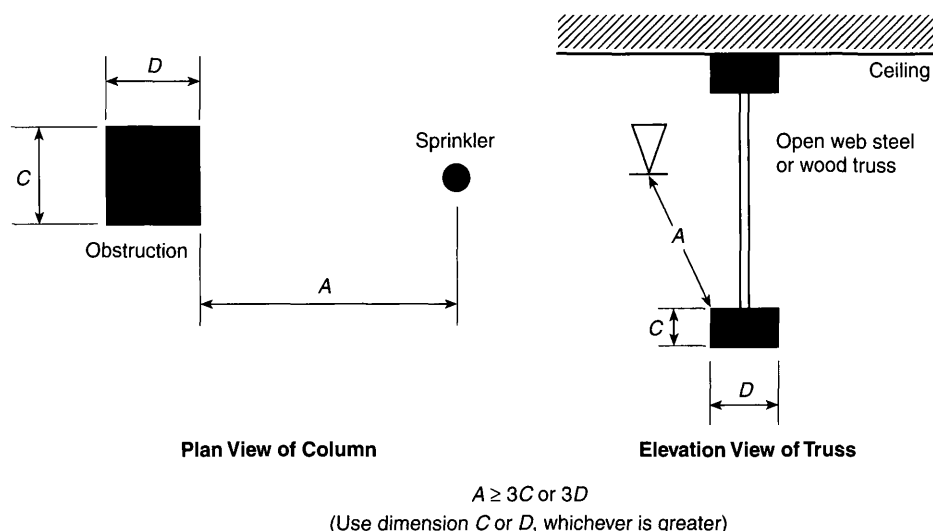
Minimum Distance from Obstruction (Large Drop Sprinkler).
